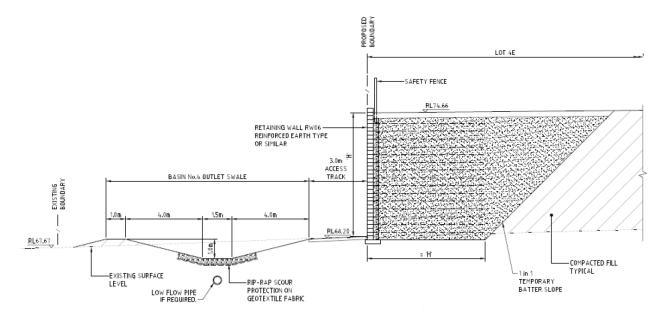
Typical Section through Retaining Wall – Southern Boundary
